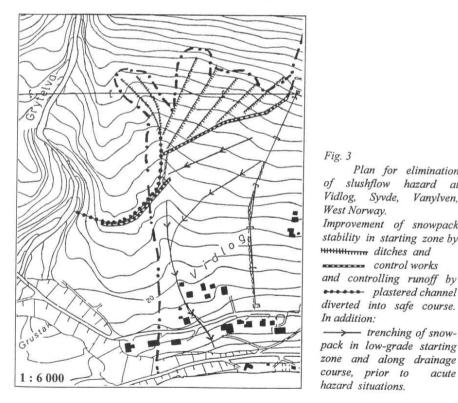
Plan for elimination of slushflow hazard at Vidlog, Syvde, Vanylven, West Norway. Improvement of snowpack stability in starting zone by HHHHHmm ditches and control works and controlling runoff by plastered channel diverted into safe course. In addition: ---- trenching of snow-
